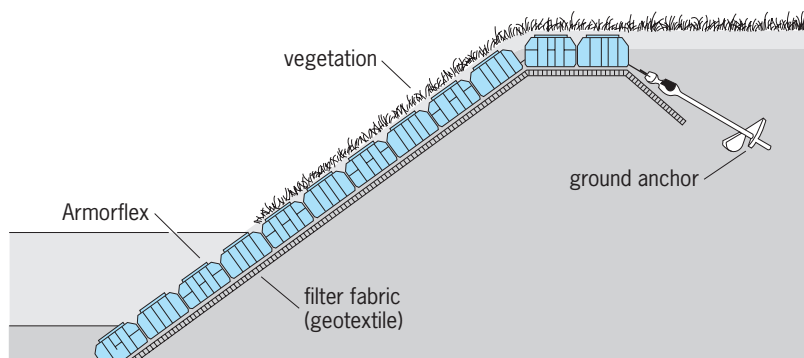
Armorflex mats made of concrete blocks connected by nylon cables are used for bank protection. (Armortec Concrete Erosion Control Systems)
